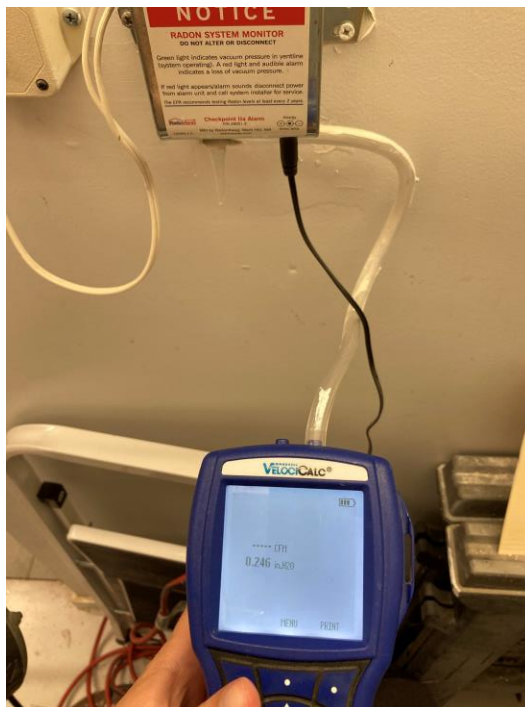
View of a vacuum reading collected from the riser pipe extending from the sub-membrane depressurization (SMD) system, and triggered alarm (facing north).
